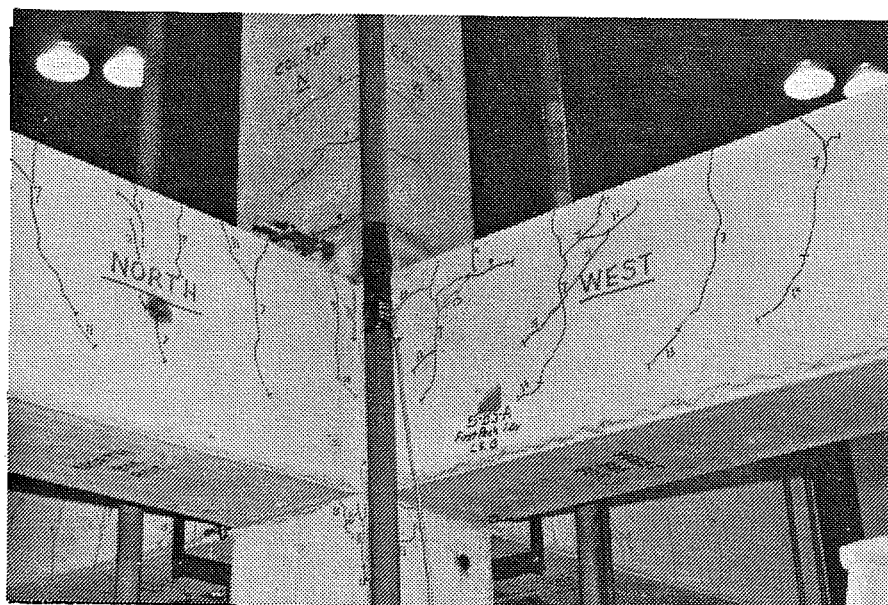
Shear cracking at joint - LS 12 - BCJ5
